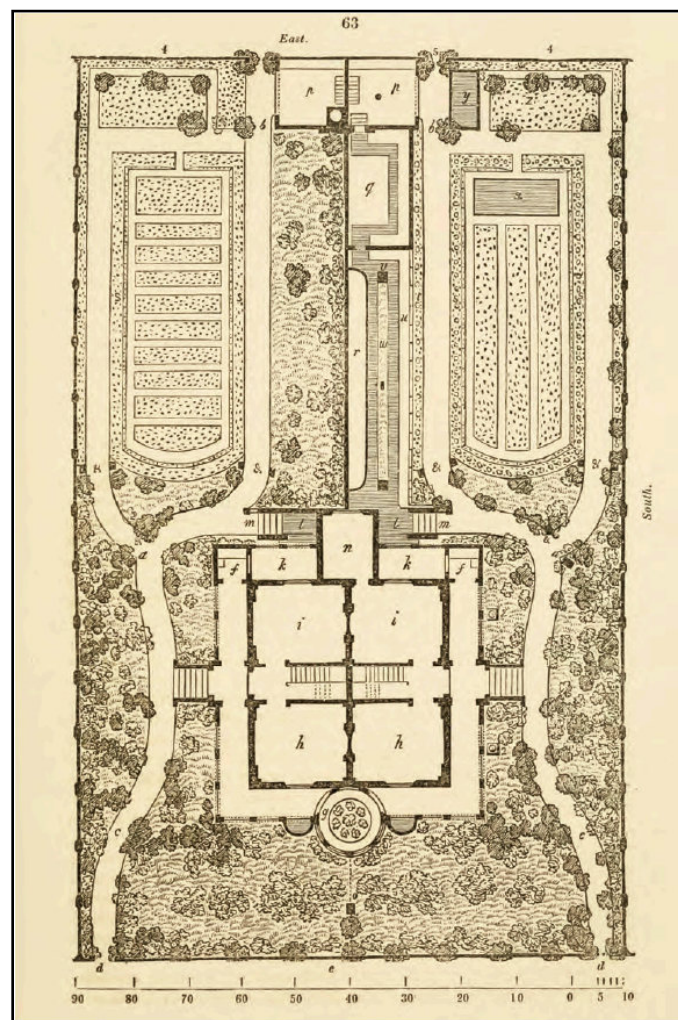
Plan of John and Jane Loudon's 1830s semi-detached villa and garden at Porchester Terrace, Bayswater.
